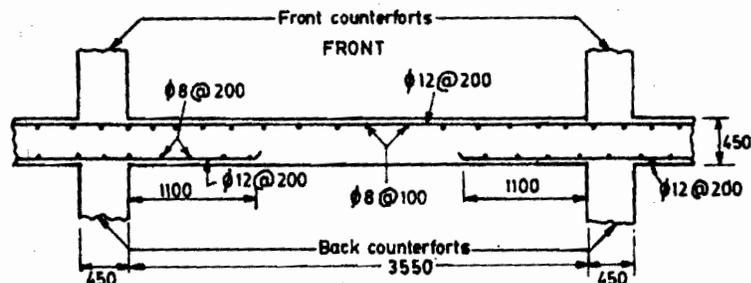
Horizontal Section through Stem Slab Showing Reinforcement
